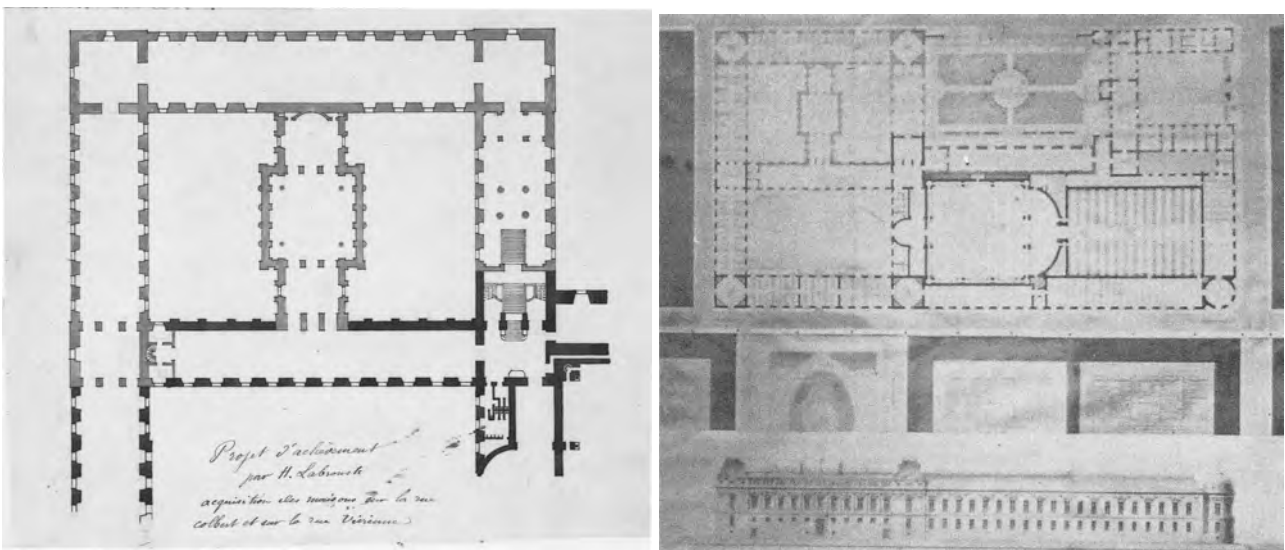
Labrouste. Bibliothèque Nationale, project for addition to northeast corner of site, 1871-73. Plan
